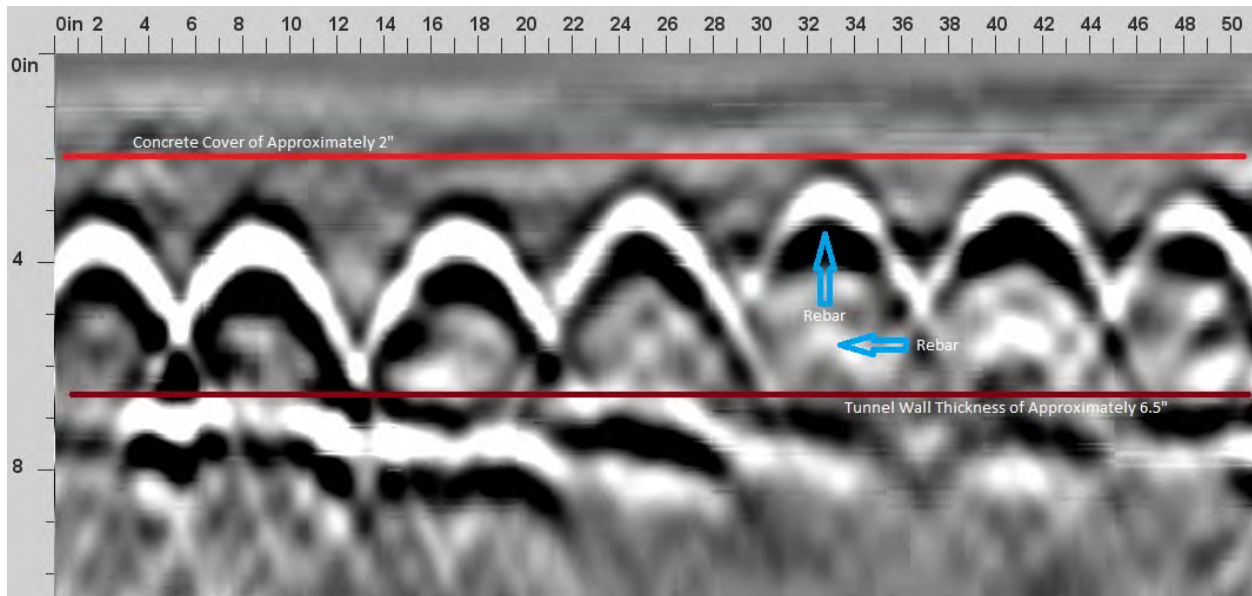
Typical GPR scan of the tunnel ceiling showing one reinforcing layer
